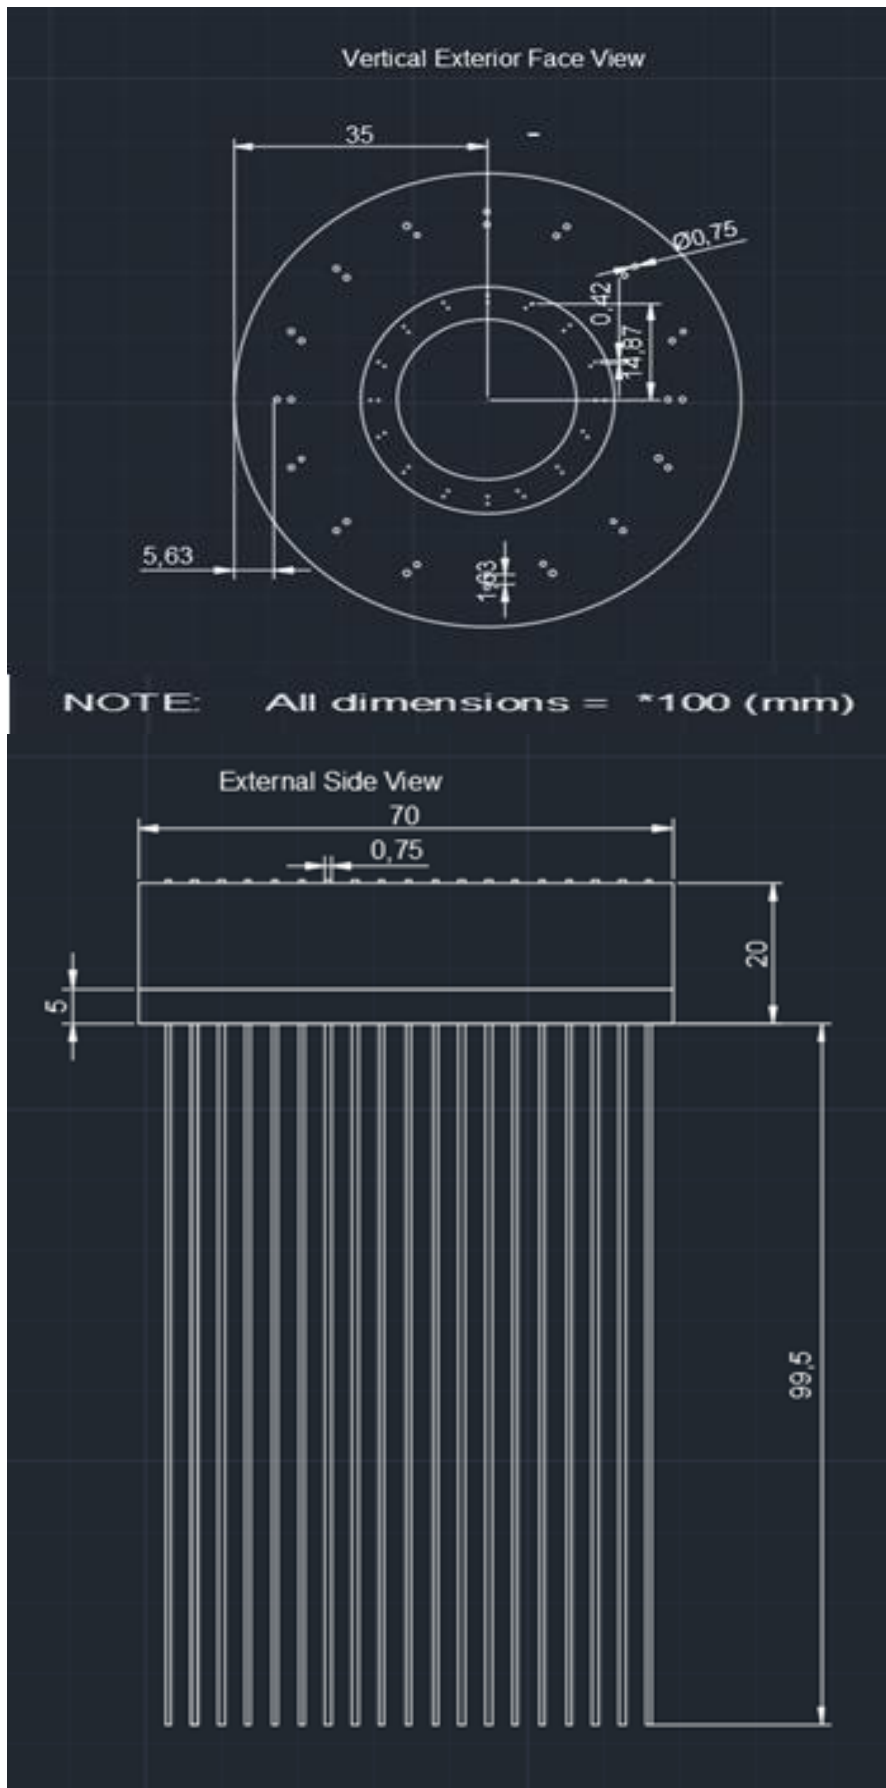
Own Foundation Design (Deep Anchor Style)
